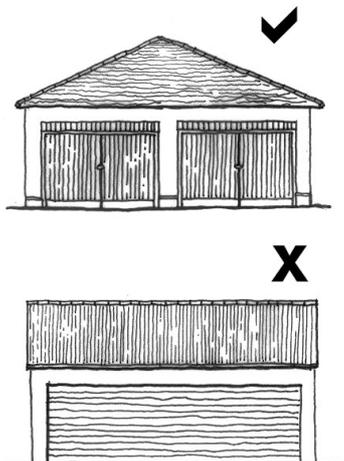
Double garages should be accessed by two separate doors divided by a pier.
